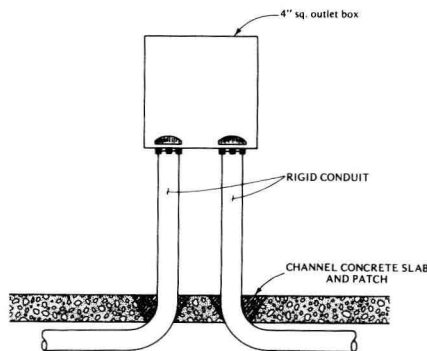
Outlet box detail with concrete slab channeled to accept conduit runs.
